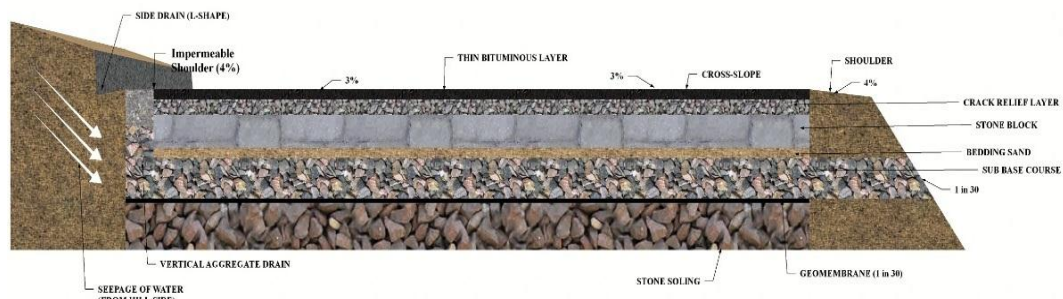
Typical cross section of Low Traffic road for moisture induced failure at the subgrade soil
